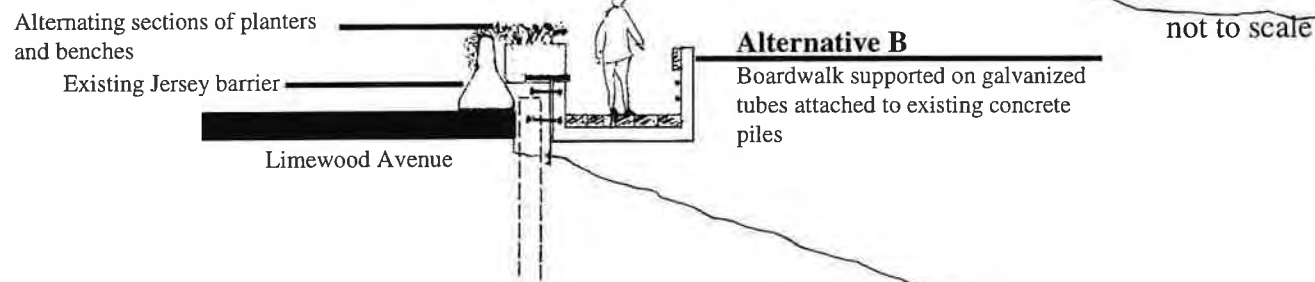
Alternate B, Jersey Barriers remain with boardwalk, benches and planter boxes.
